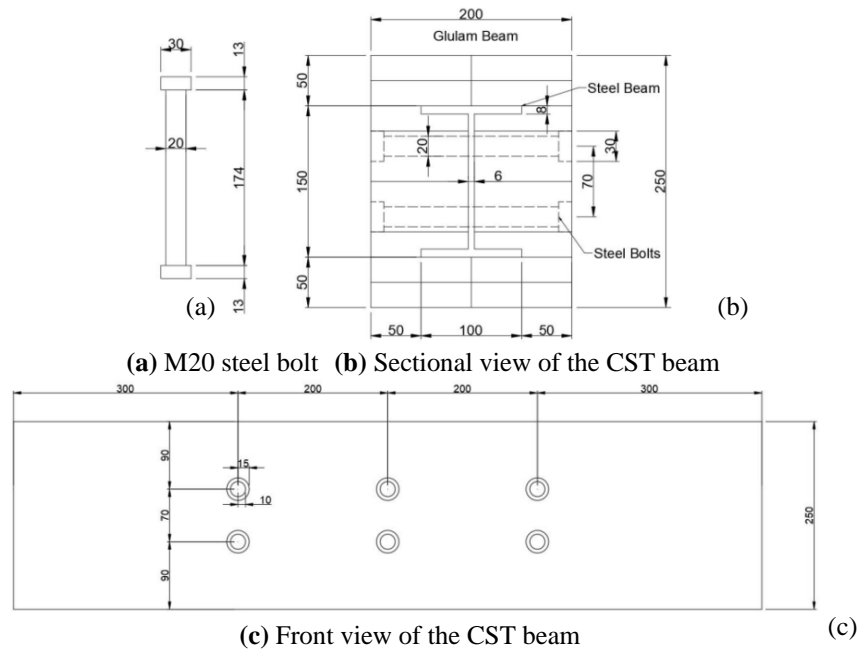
Profiles of the CST beam model and M20 steel bolts for the beam
